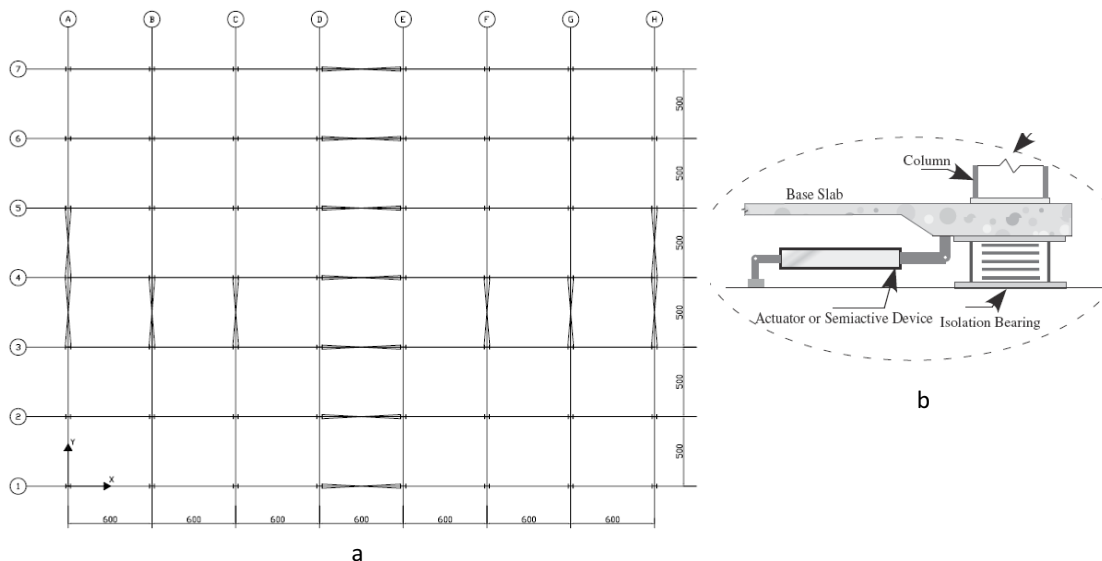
a) Plan of a building; b) base isolation system and MR damper [Narasimhan., Nagarajaiah., Johnson and Gavin HP,2006]
